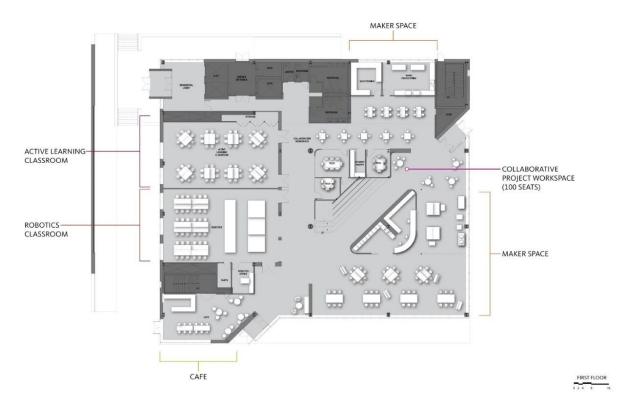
Floorplan schematic of the Foisie Innovation Studio
